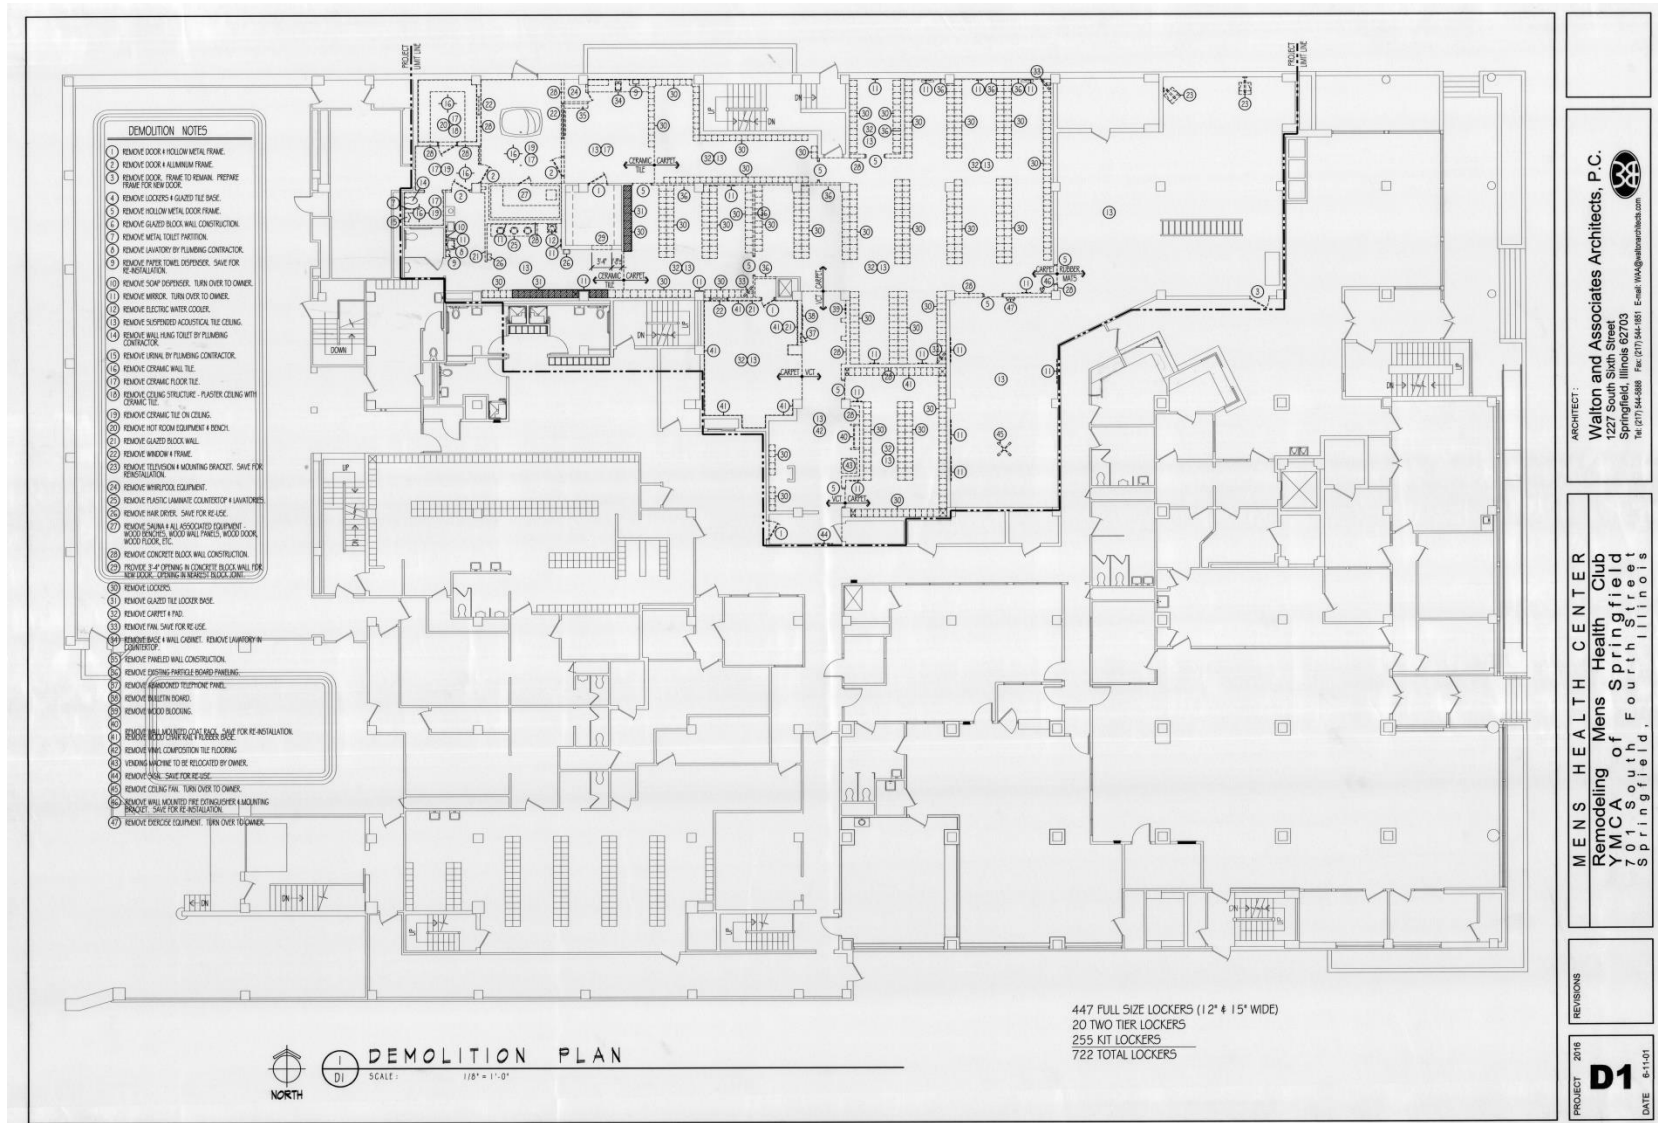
Demolition Plan, Men's Health Center (Walton and Associates 2001; Sheet No. D1).
